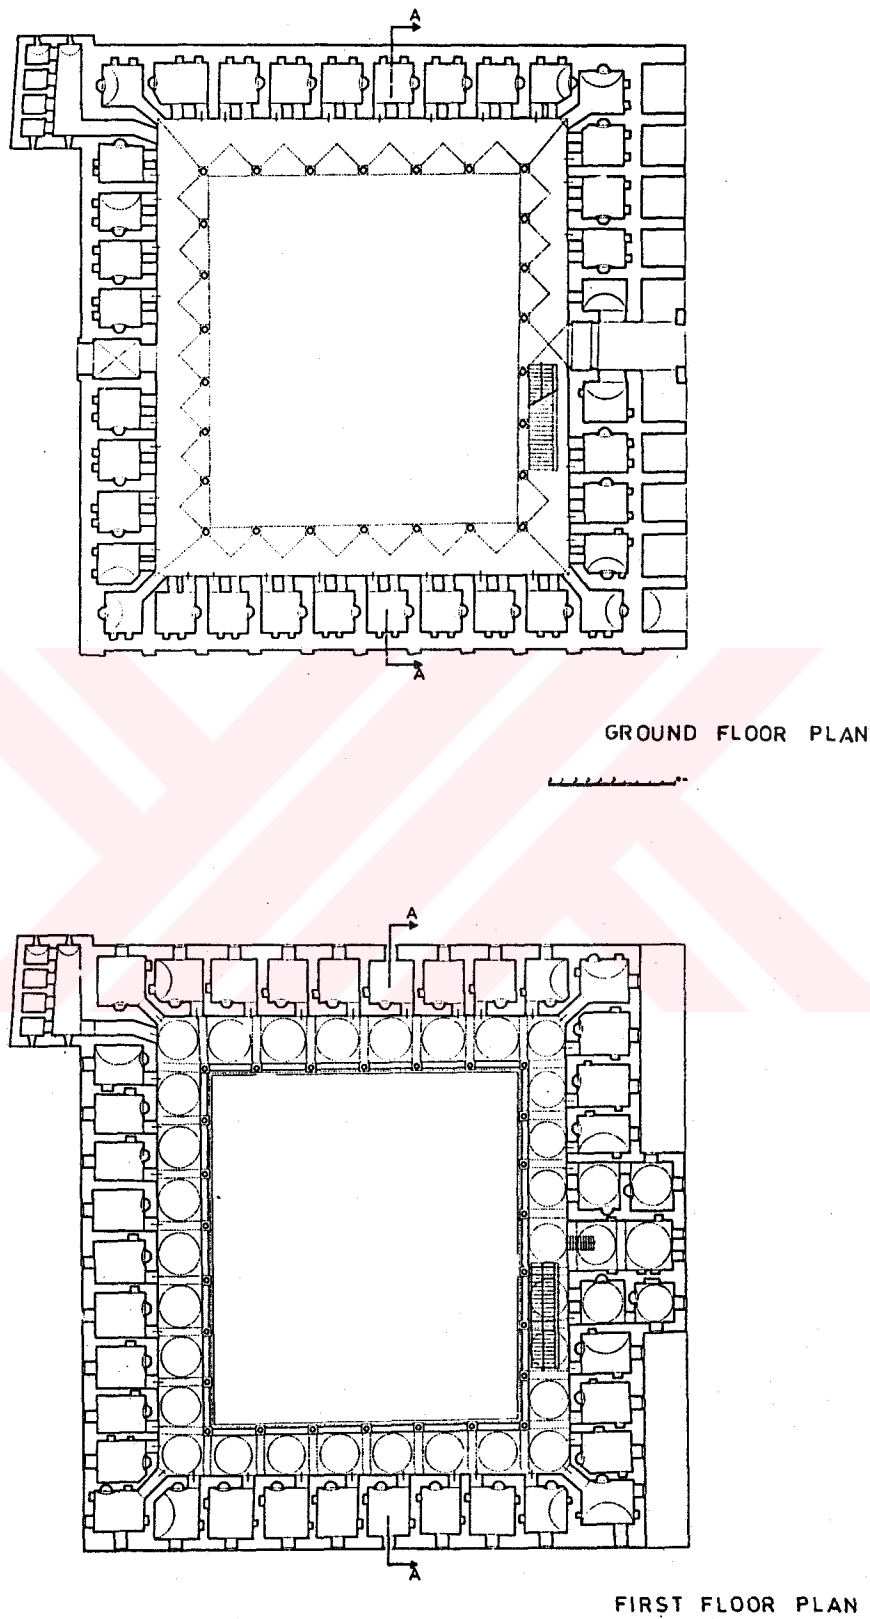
Kurşunlu Khan in Manisa - Plan Drawings
